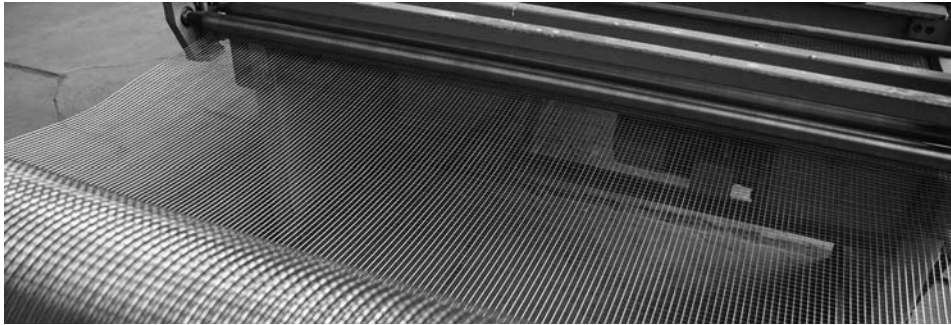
Micro mesh reinforcement mats *MicroMat*, to be stapled over the entire cross section of the concrete element
